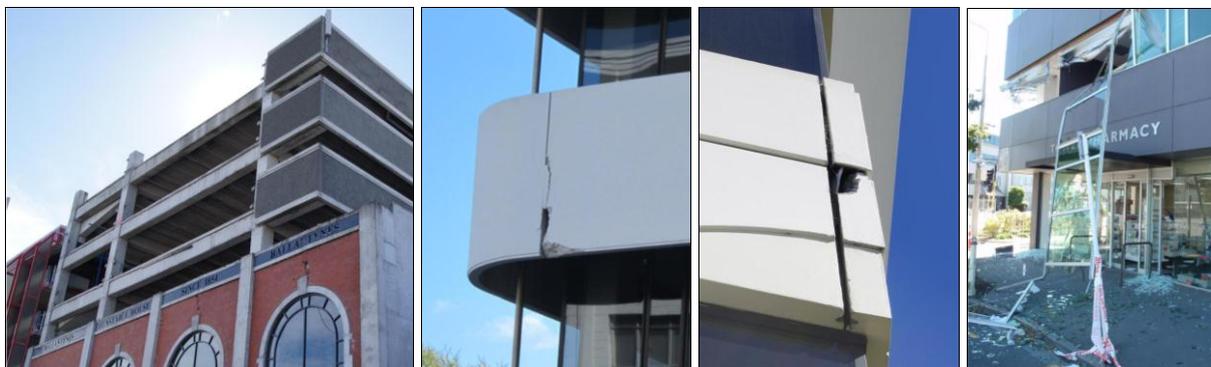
Cladding damage to multi-storey buildings in Christchurch CBD (Baird et al., 2012)
